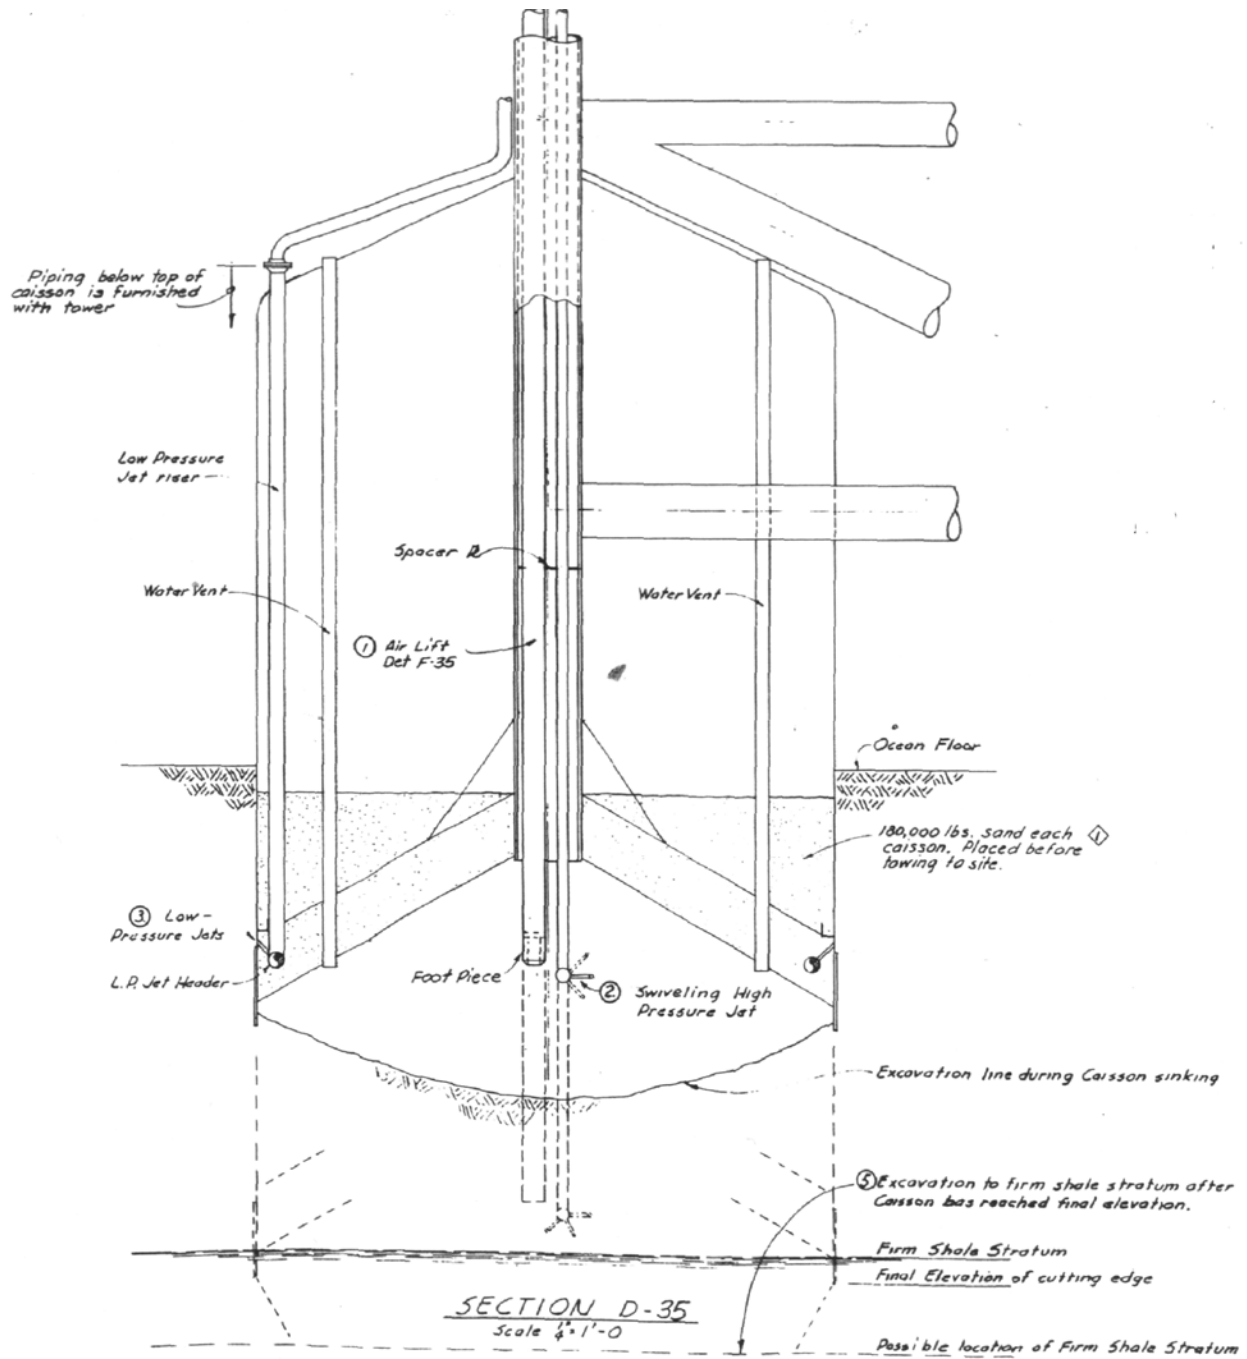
Cross-section of Platform Hazel Caisson Showing Excavation Chamber
